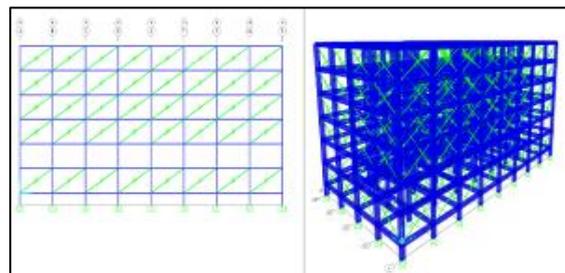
Elevation & 3D View of G+5 soft storey at first floor.
